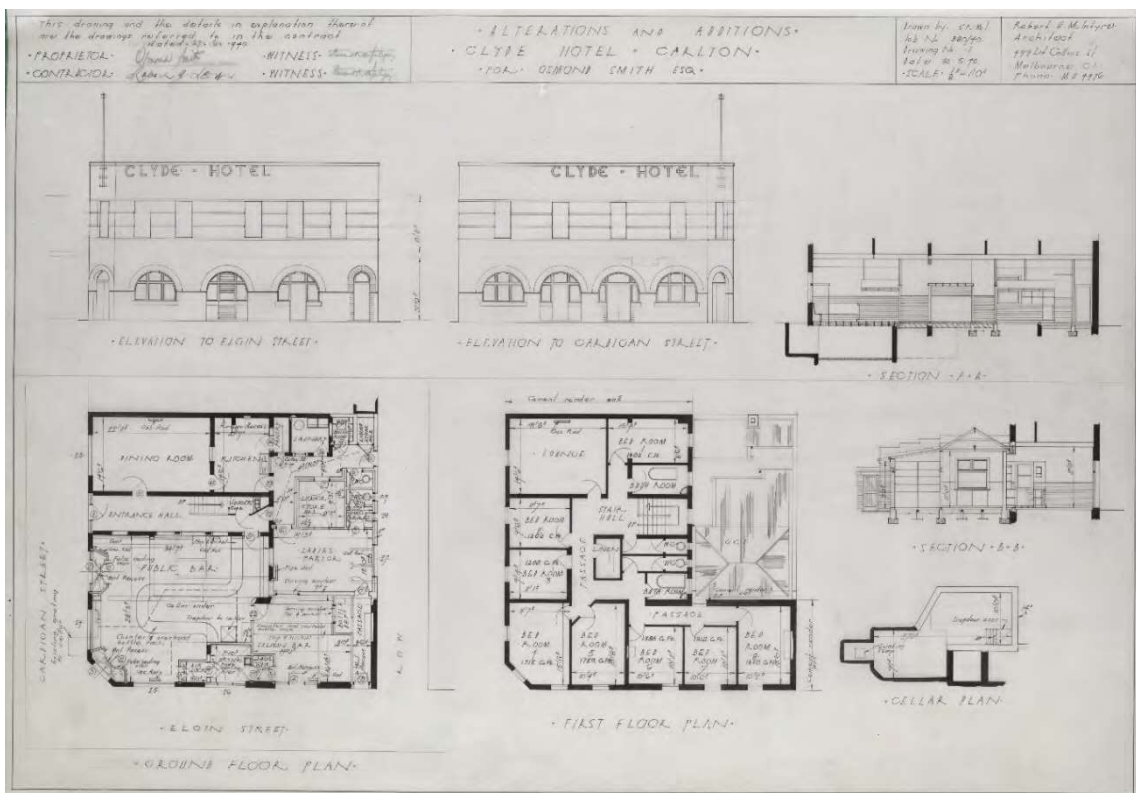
Plan of 1940 renovation works to the Clyde Hotel, designed by Robert H McIntyre
